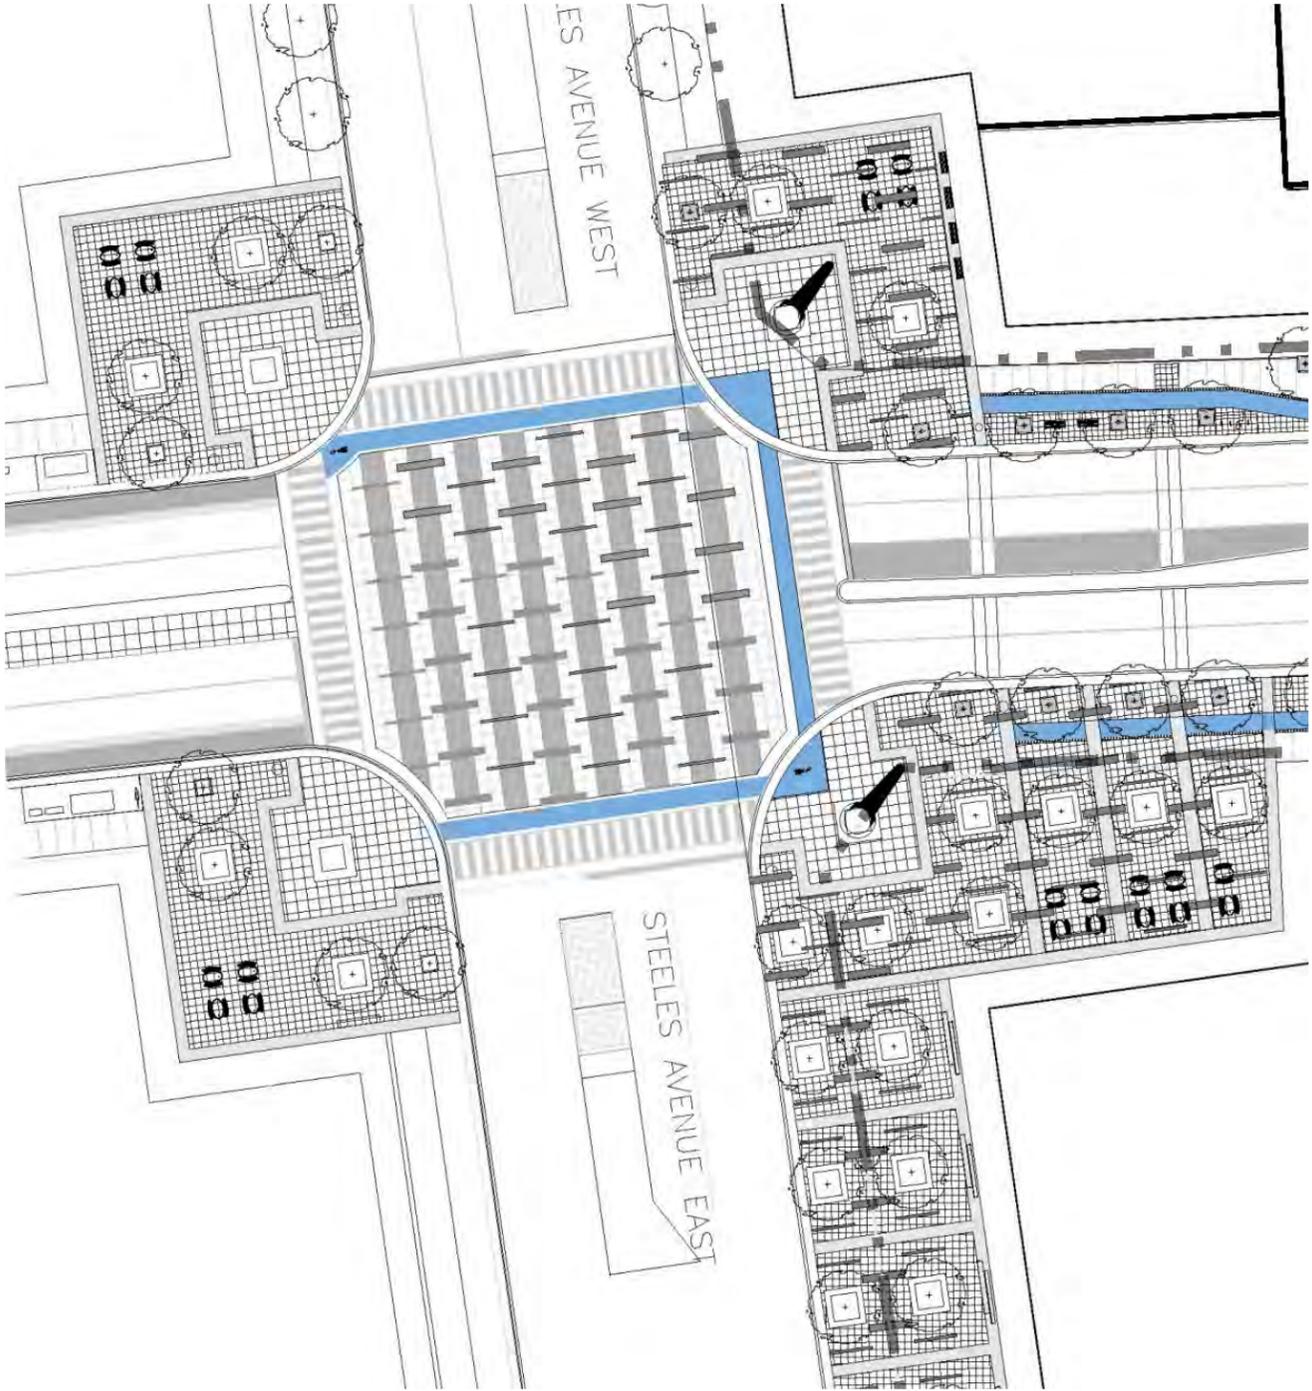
Intersection Detail Area Plan - Yonge Steeles Gateway
